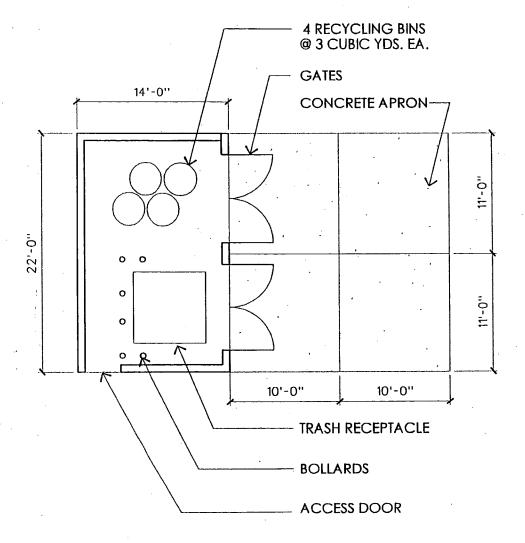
EXHIBIT 'C' BUILDING A TRASH ENCLOSURE, B SIMILAR
